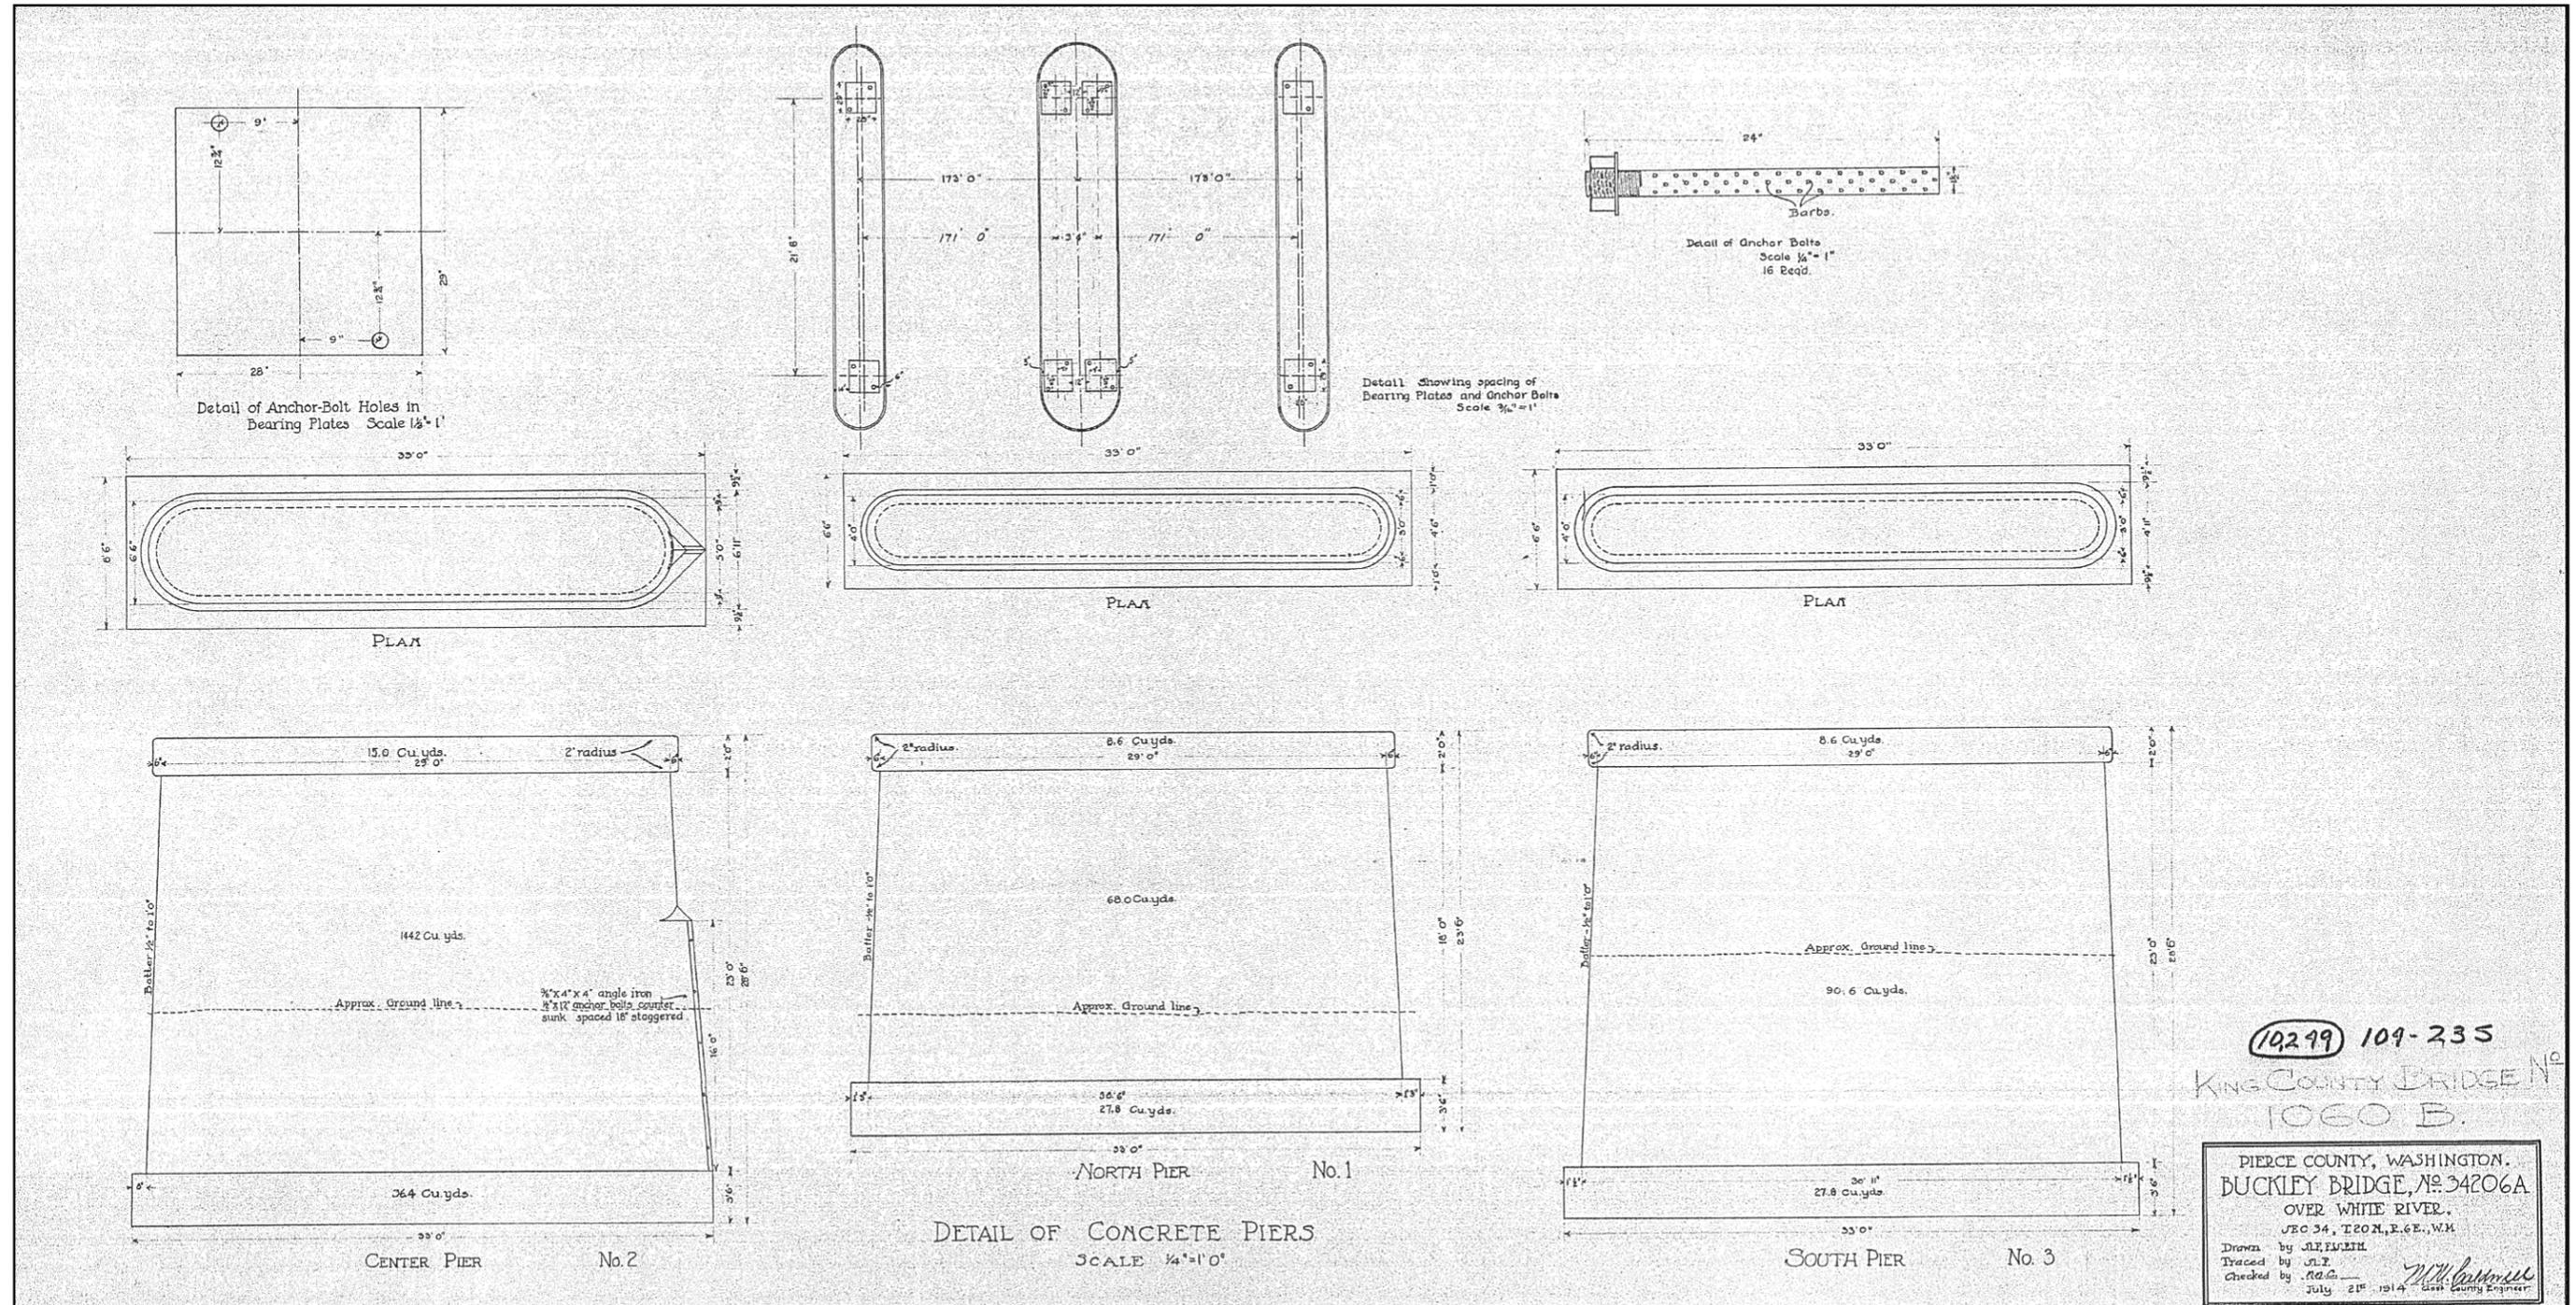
Piers 1, 2, and 3 from Old SR 410 Bridge over the White River
